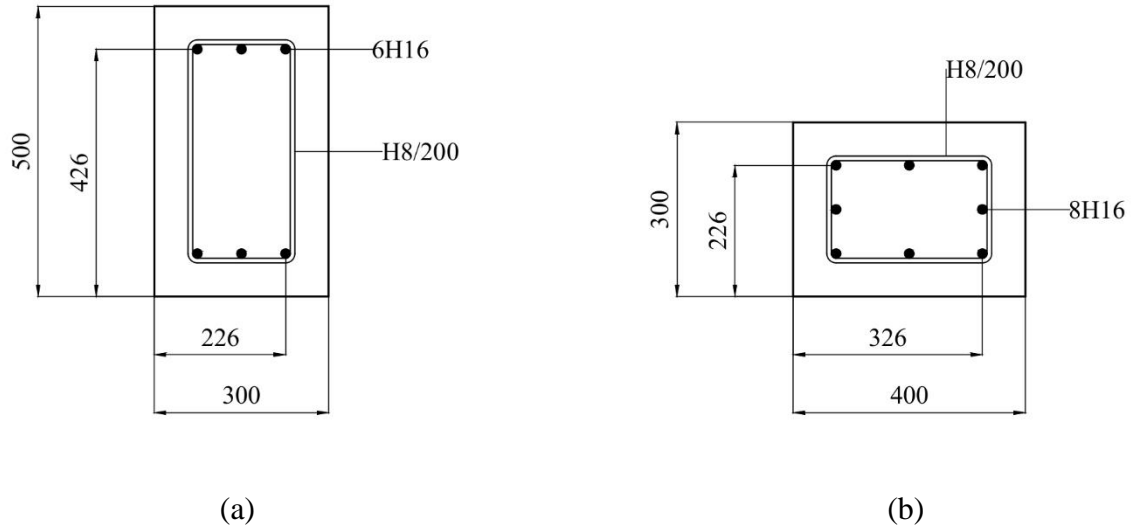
Cross-section details of the reinforced concrete members that for the junctions: (a) beam and (b) column (units: millimetre).
